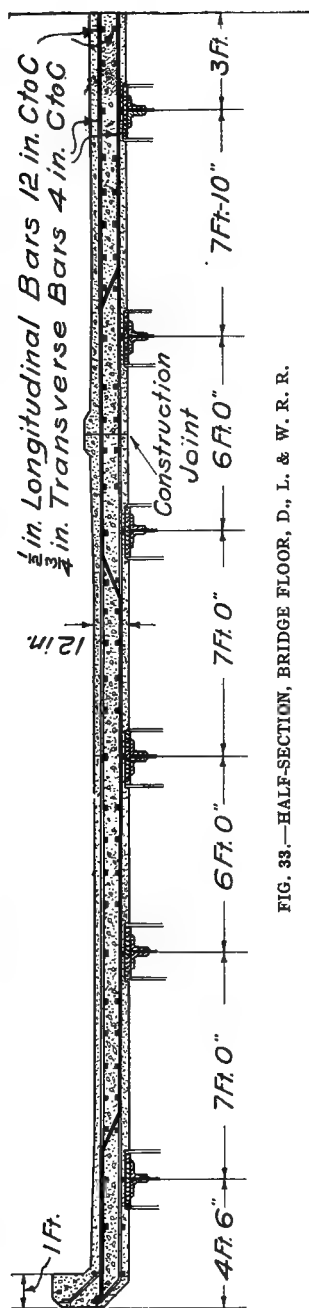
HALF-SECTION, BRIDGE FLOOR, D., L. & W. R. R.
